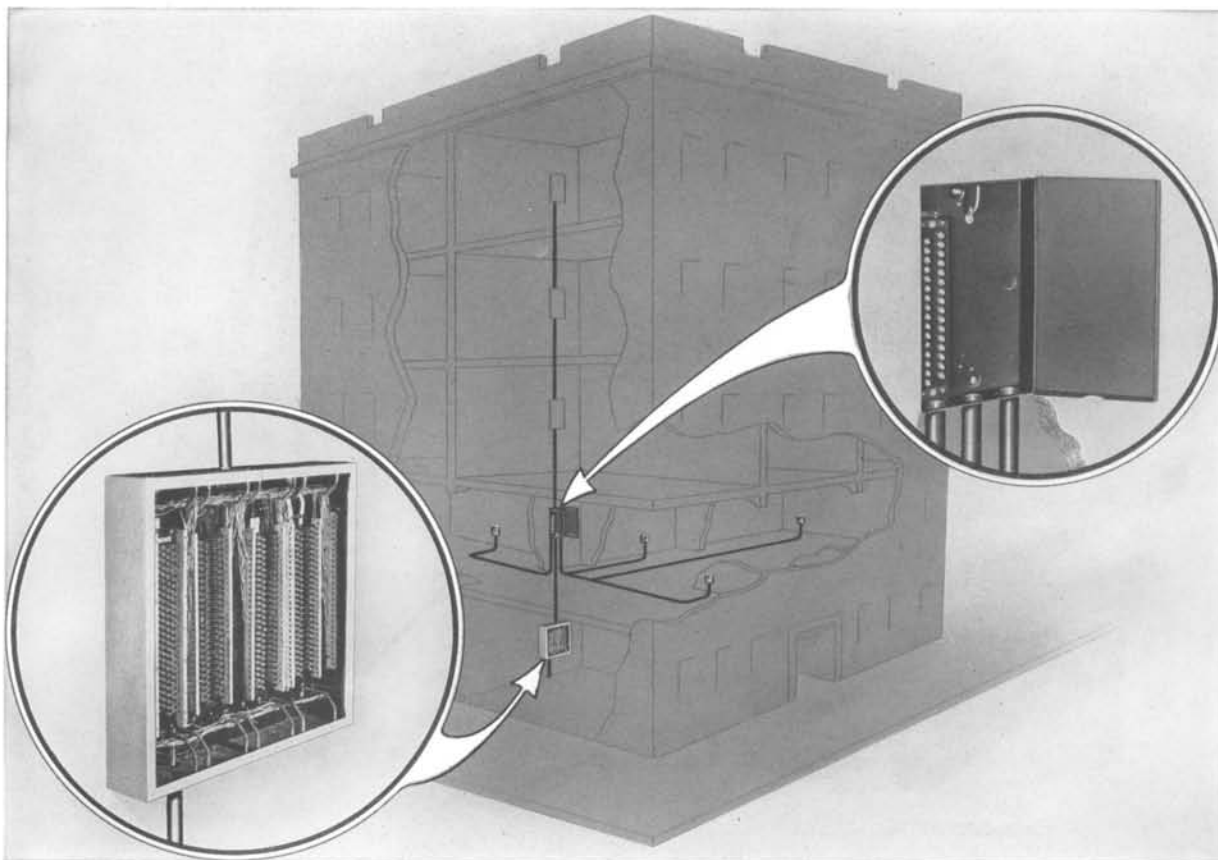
APARTMENT HOUSE CONDUIT DISTRIBUTION
